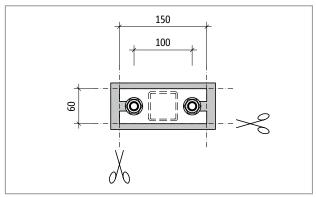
Schöck Isokorb $^{\circ}$ T type S-V: Dimensions according to cutting of insulating element
